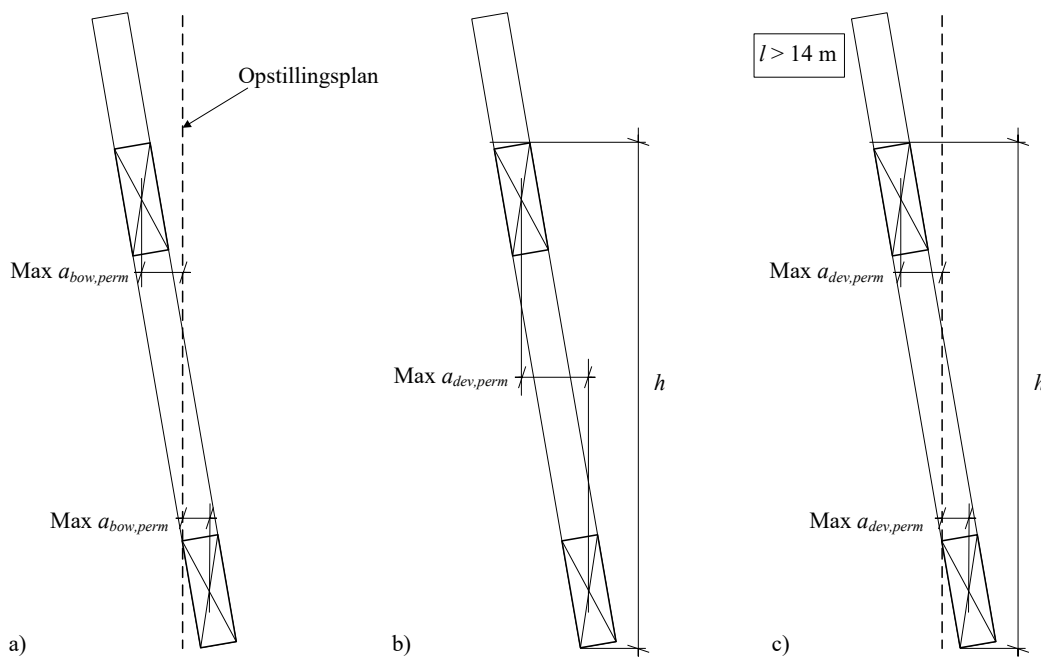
DK NA - Erection tolerances for trusses with punched metal plate fasteners
